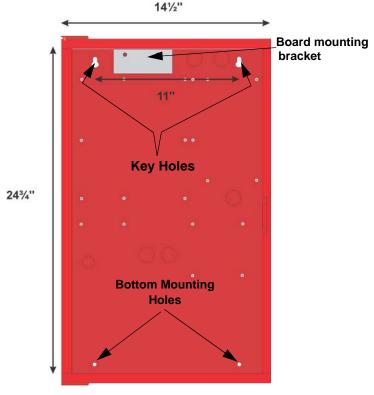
Cabinet Flush Mount Dimensions and Mounting Hole Locations
